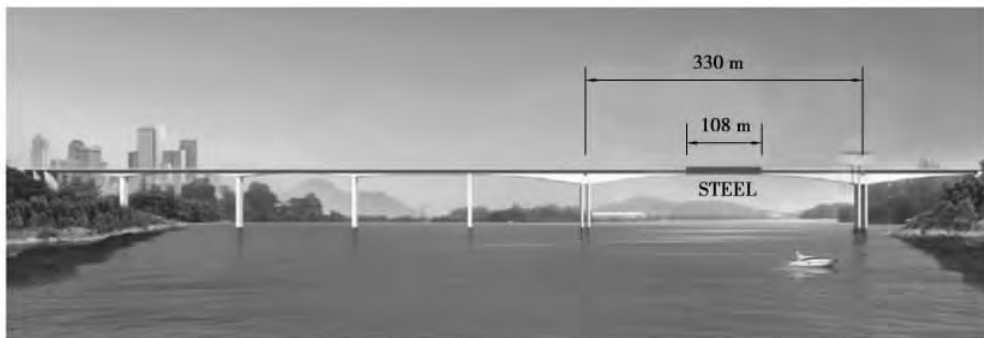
Shibampo Bridge — A Concrete and Steel Hybrid Structure
